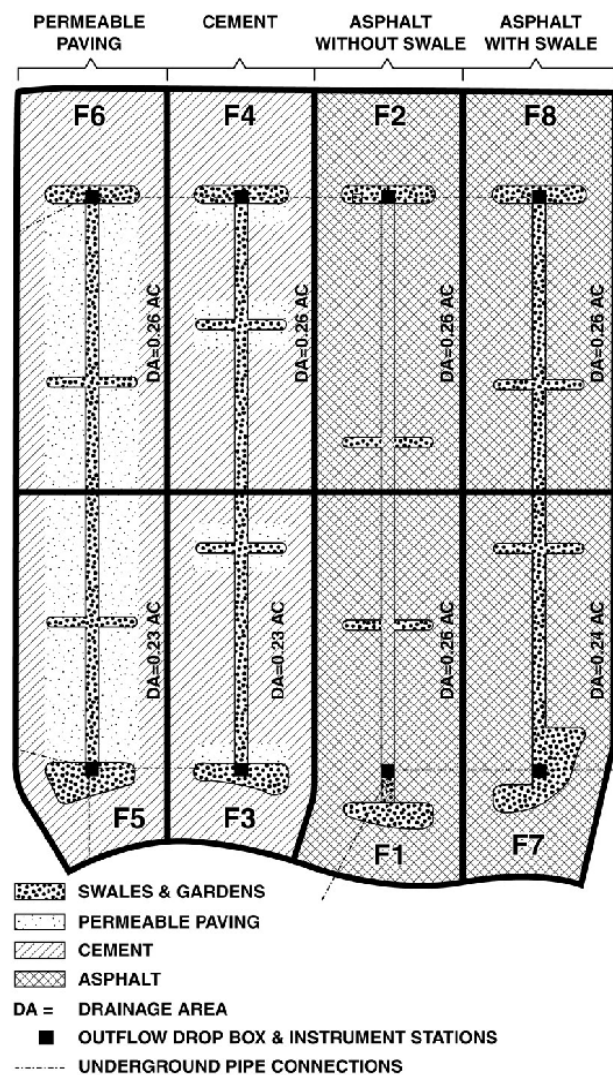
Site plan of the parking lot swales delineated by the dotted lines
